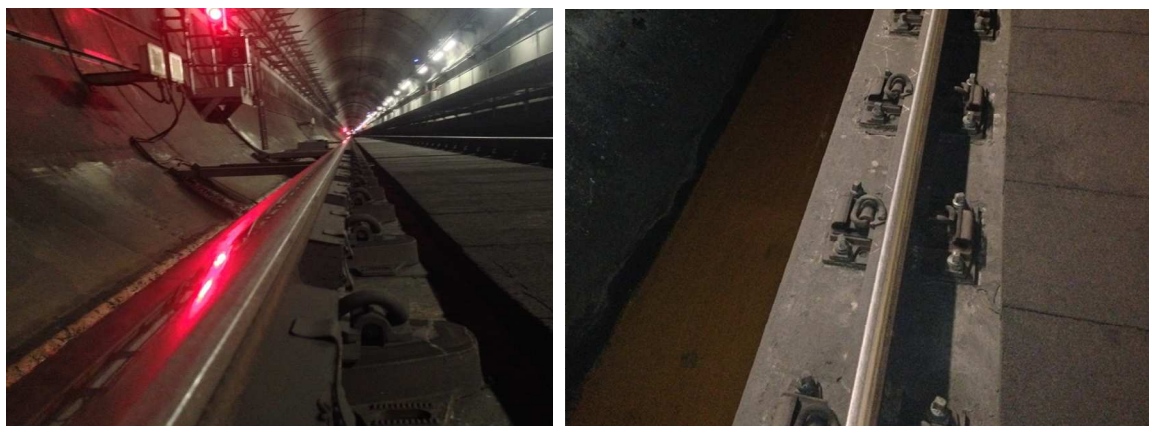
Left - Direct Fixation Fastener via Delkor Sydney Egg baseplates with rail dampers;
